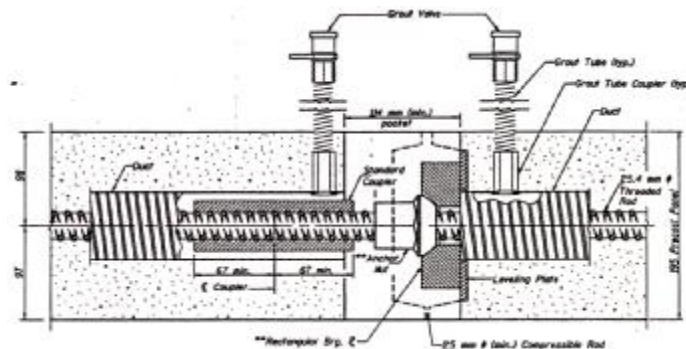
Coupler detail of Post-tensioned tendon
